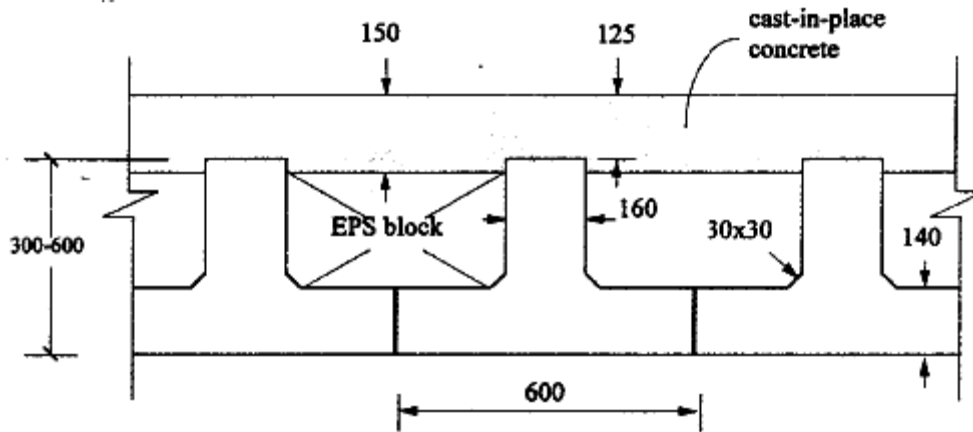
Cross section of the IT System (dimensions are in mm) (Kamel and Tadros, 1996)
